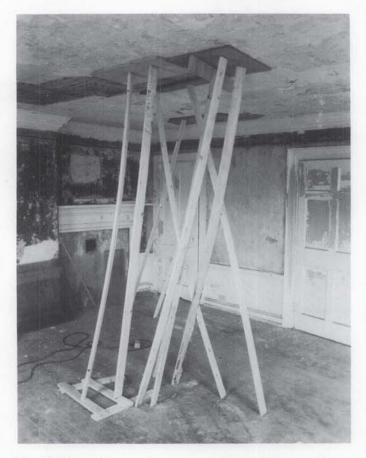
When ceiling repairs are made with wet plaster or with an injected adhesive mixture, the old loose plaster must be supported with a plywood brace until re-keying is complete. Photo: John Leeke.
